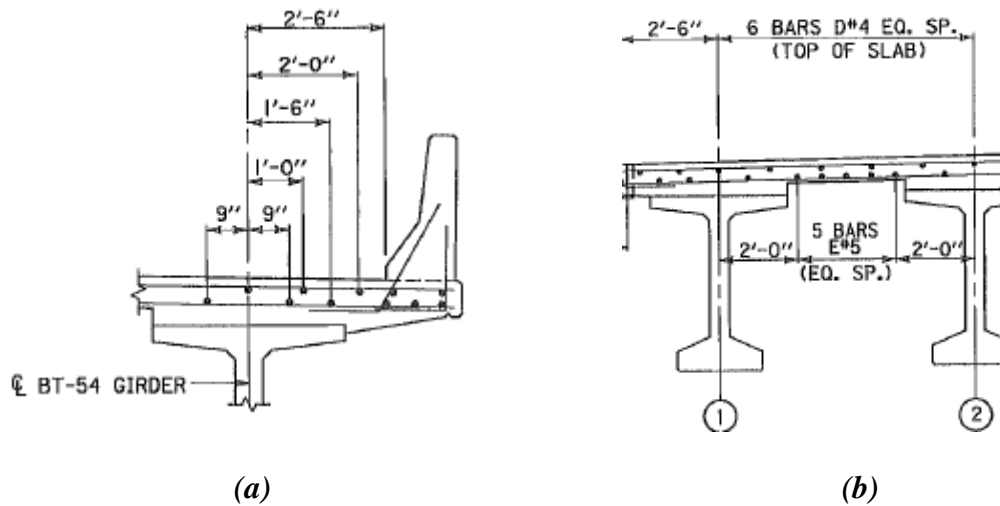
Nonprestressed reinforcement in the deck at (a) near the barriers and (b) between the interior girders of the bridge.
